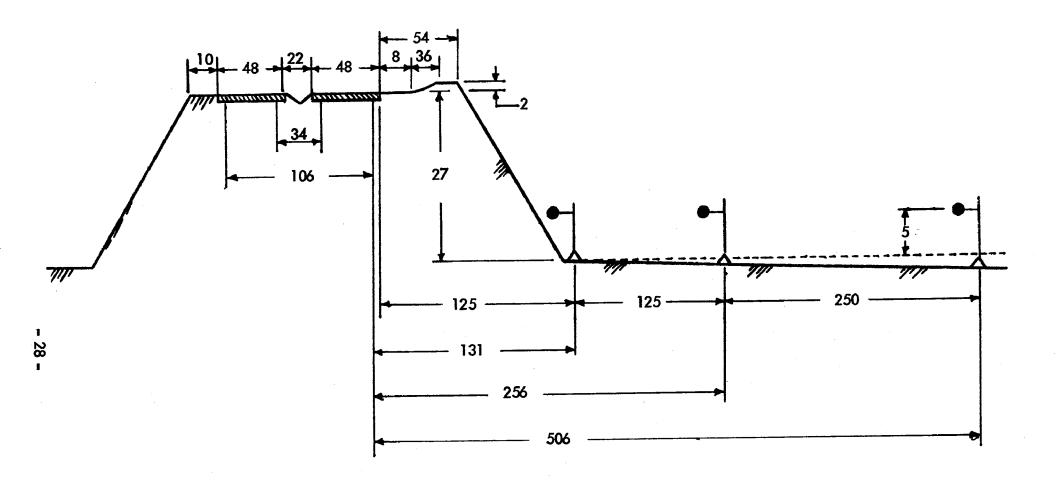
Site 10: Elevated Highway Configuration 8-Lane Freeway
